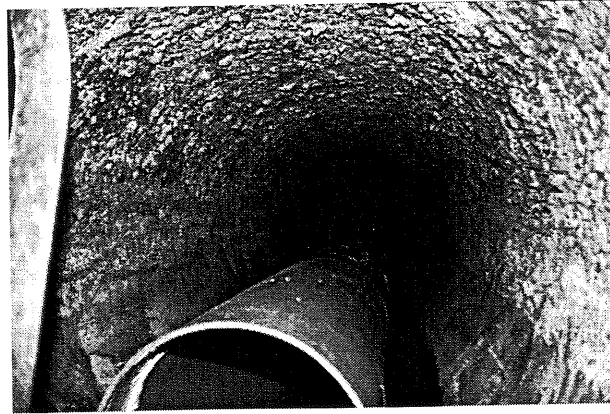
Joint Assembly and Pushing Rigging within Manhole
